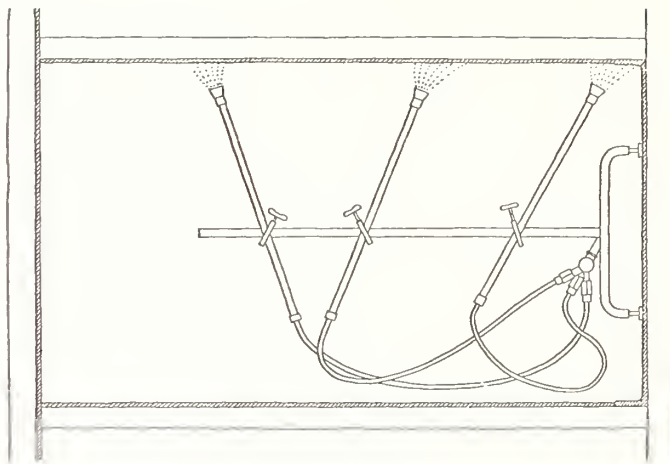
Shower arrangements placed in a bathroom cabin. The gentle showers can be directed towards all connections where water leakage might occur.
